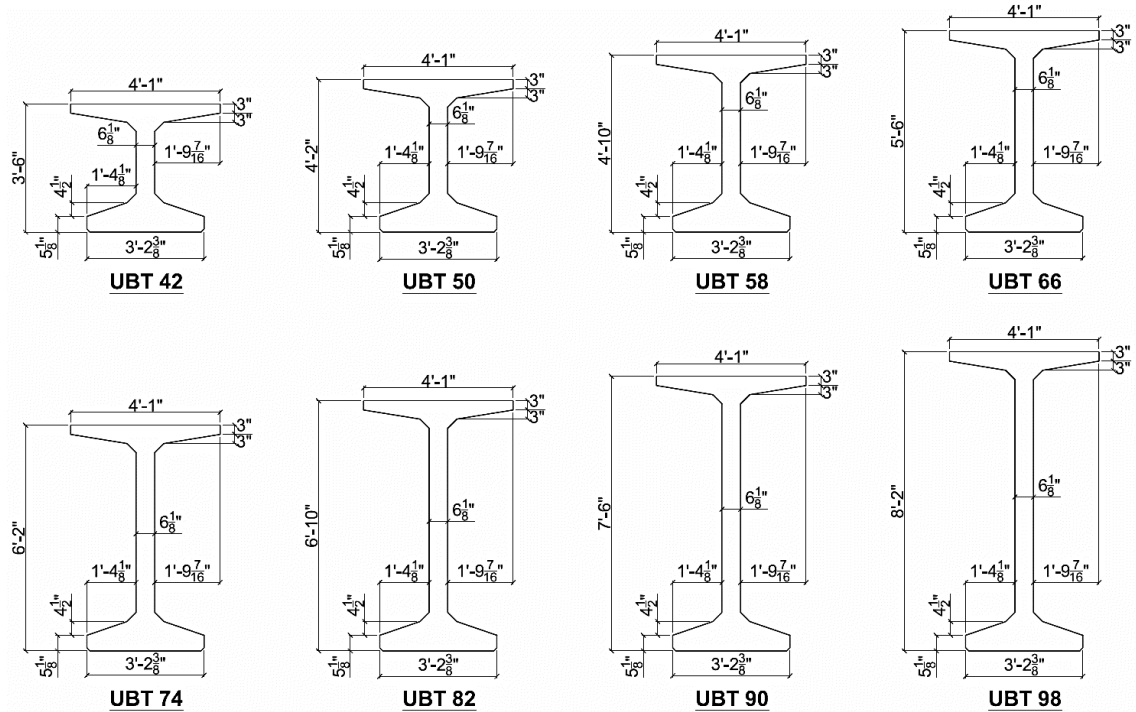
Precast bulb-tee girders (Source: UDOT 2010b)
